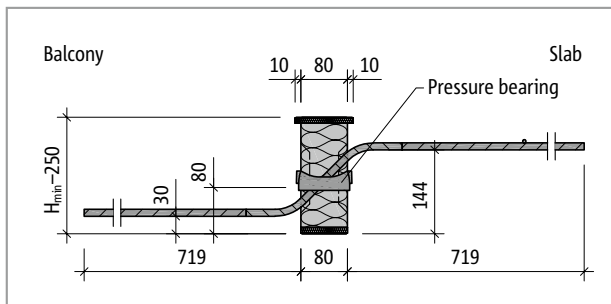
Schöck Isokorb® T type Q-V9 to Q-V11: Product section
